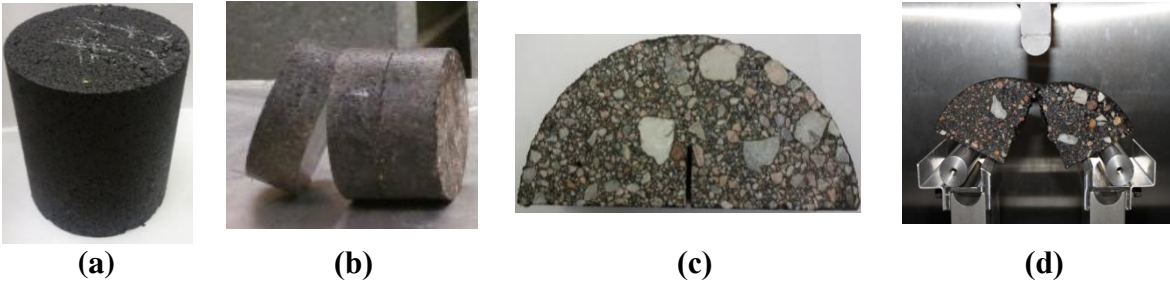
SCB specimen fabrication process: (a) compacting, (b) slicing, (c) notching, and (d) fracture testing configuration.
